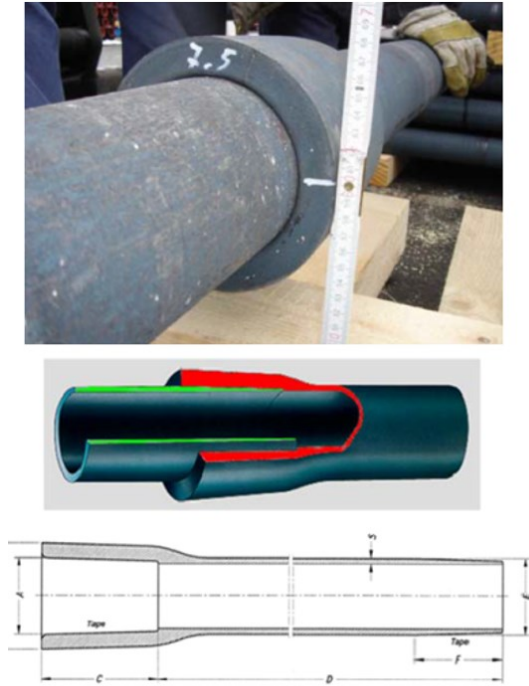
Ductile iron driven piles with a section of 170x7.5mm.
